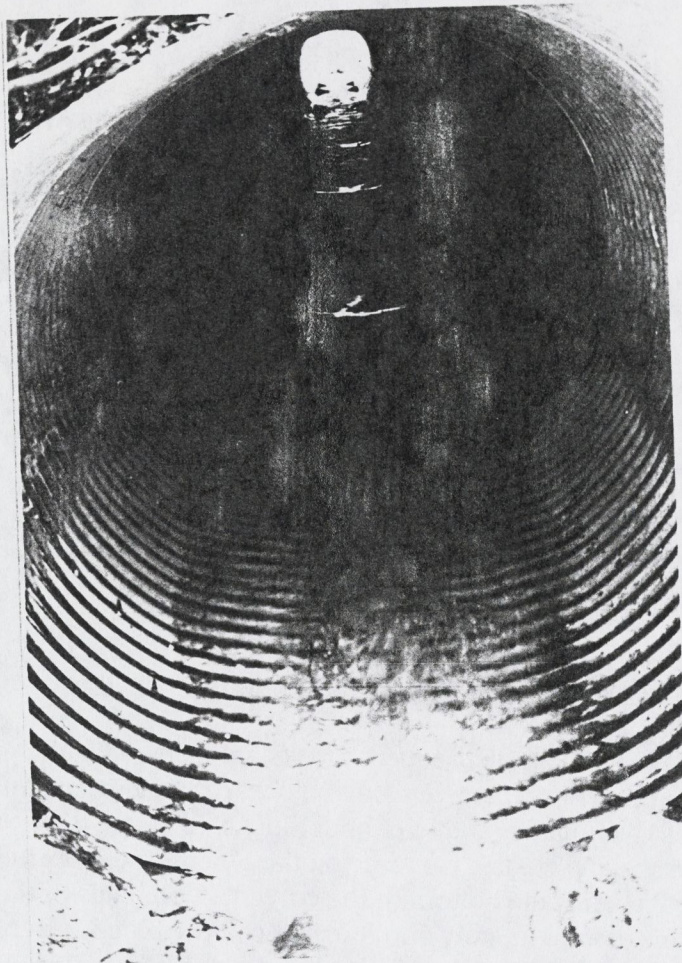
Trinity Creek Culvert - Full Length Inside View, Following Downrigger Installation
